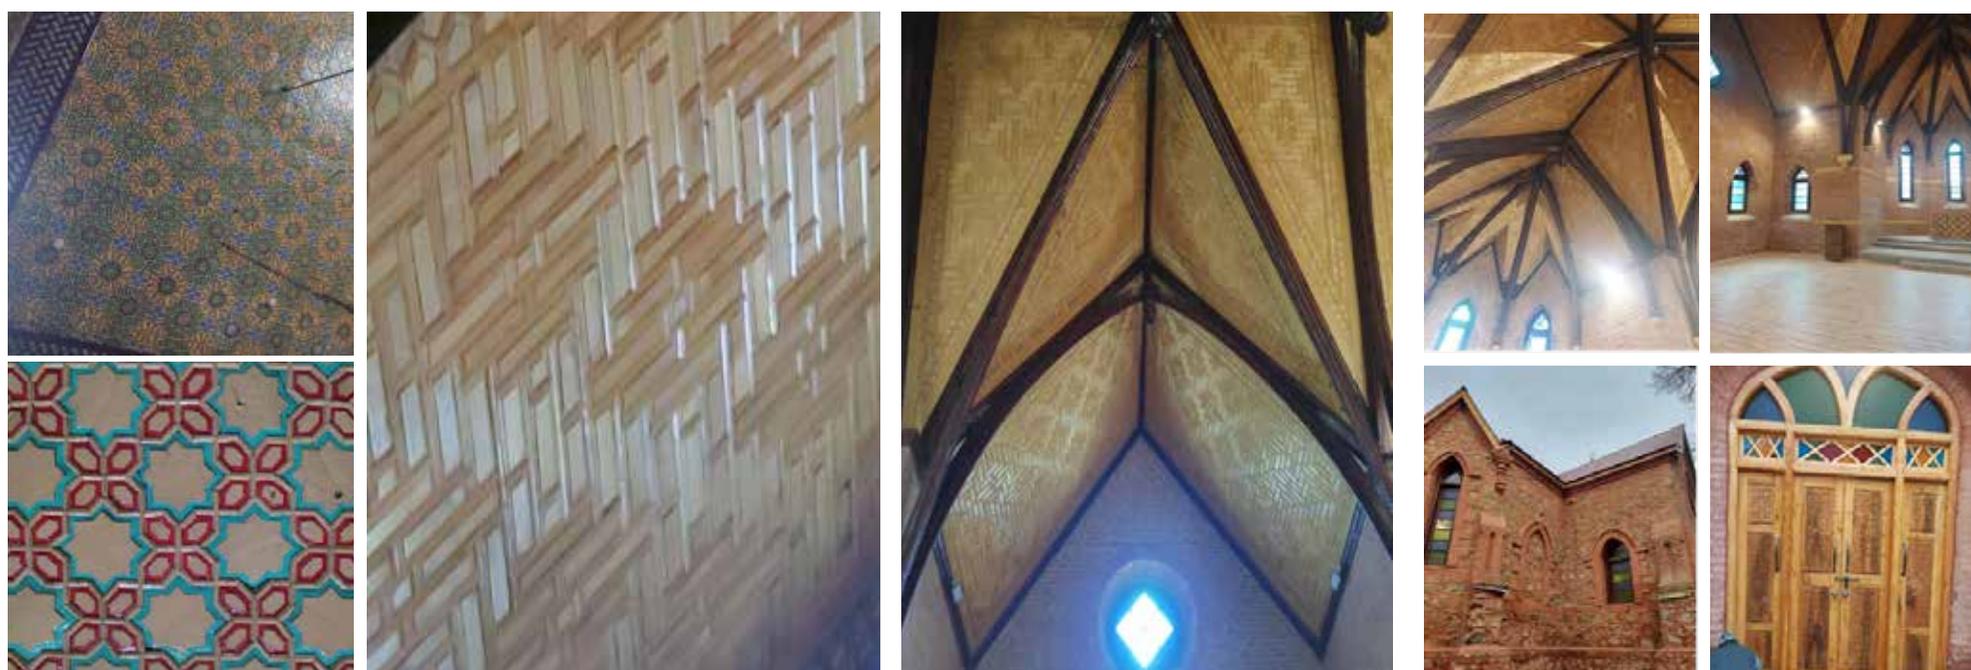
Clockwise from top a. Pattern of Khatamband ceiling in Khankah-e-Maula, Srinagar, b. pattern of restored Khatamband ceiling St. Luke's Church c. restored Khatamband ceiling and roof truss St. Luke's Church. d. Pattern of Khatamband walls in Ziyarat Naqashband Sahab
